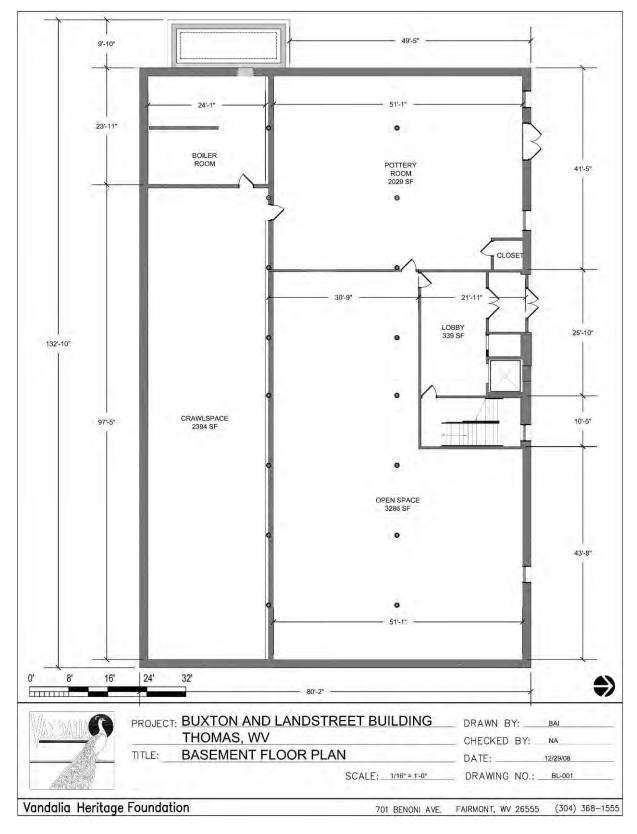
Buxton and Landstreet Company Store Floor Plan, Basement
